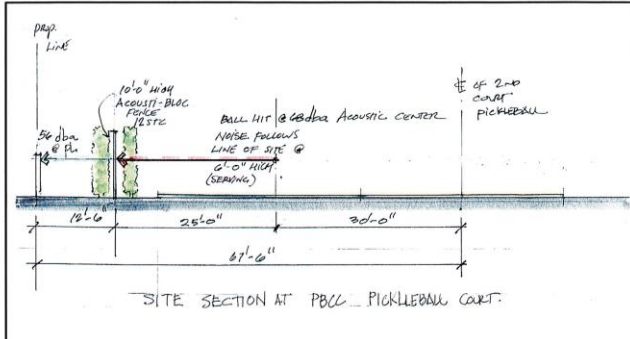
Site section (west to east) of proposed pickleball courts (refer to attached Site Plan).
